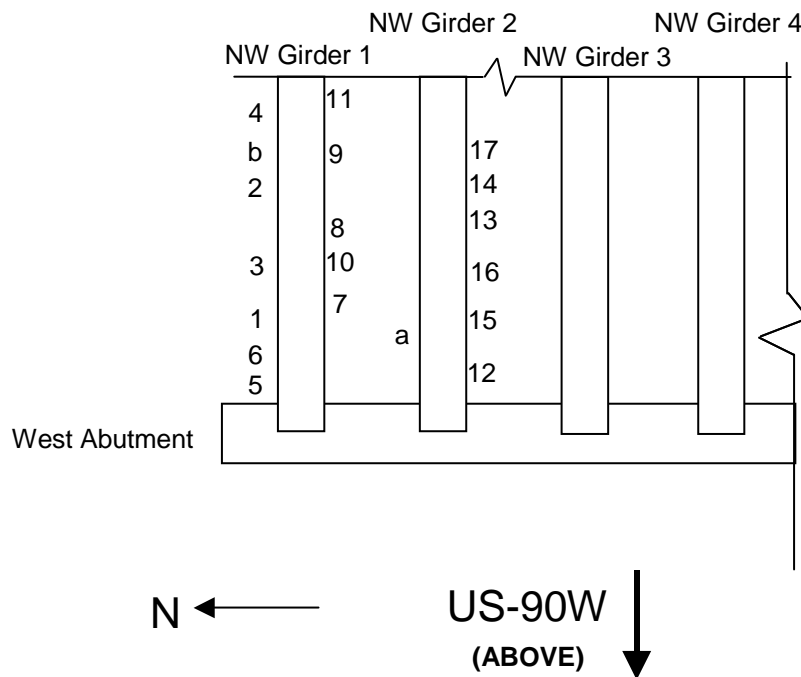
Schematic of crack-measurement locations on US-90 structure (plan view)
